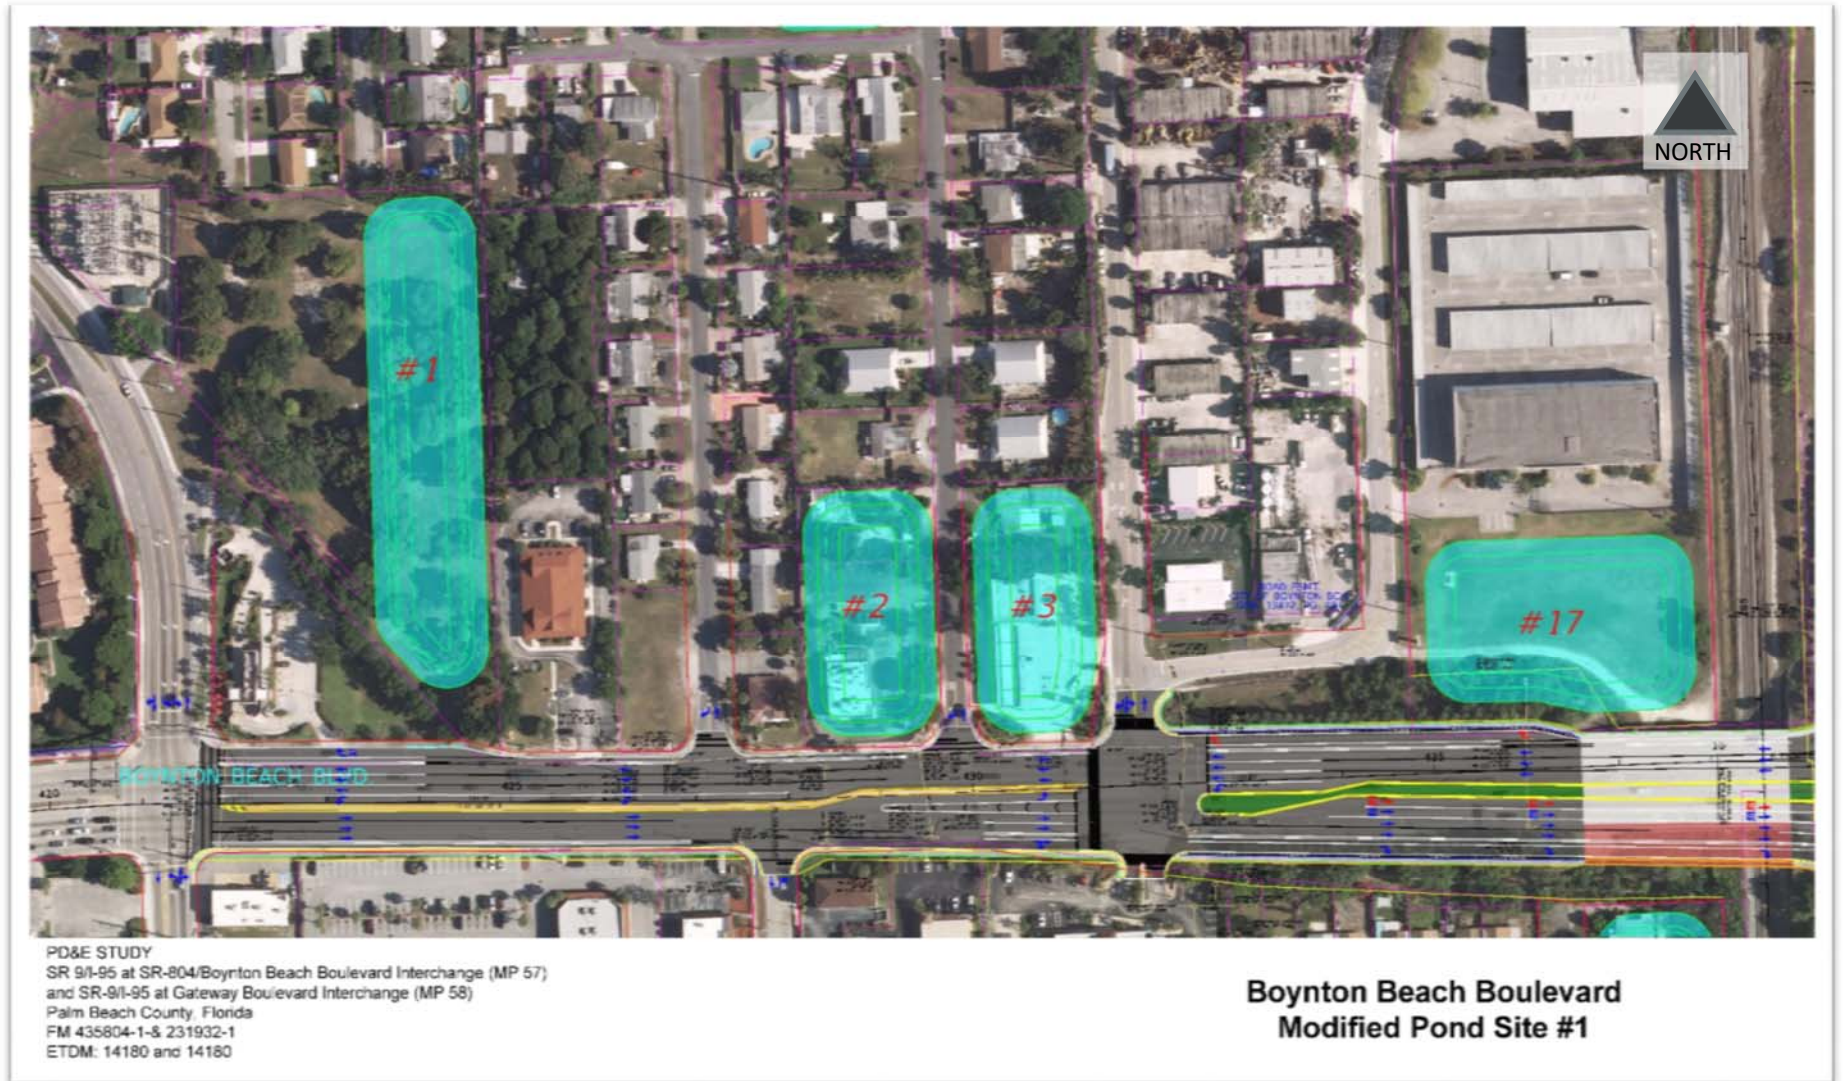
Modified Pond Site #1 Boynton Beach Boulevard
